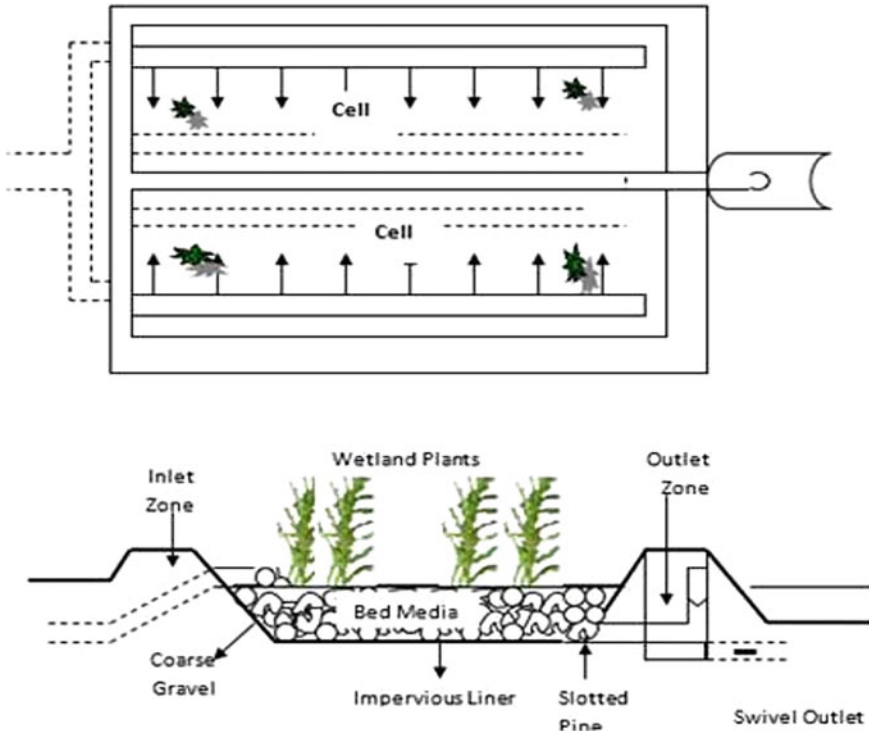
Plan and cross-sectional view of a subsurface flow wetland
